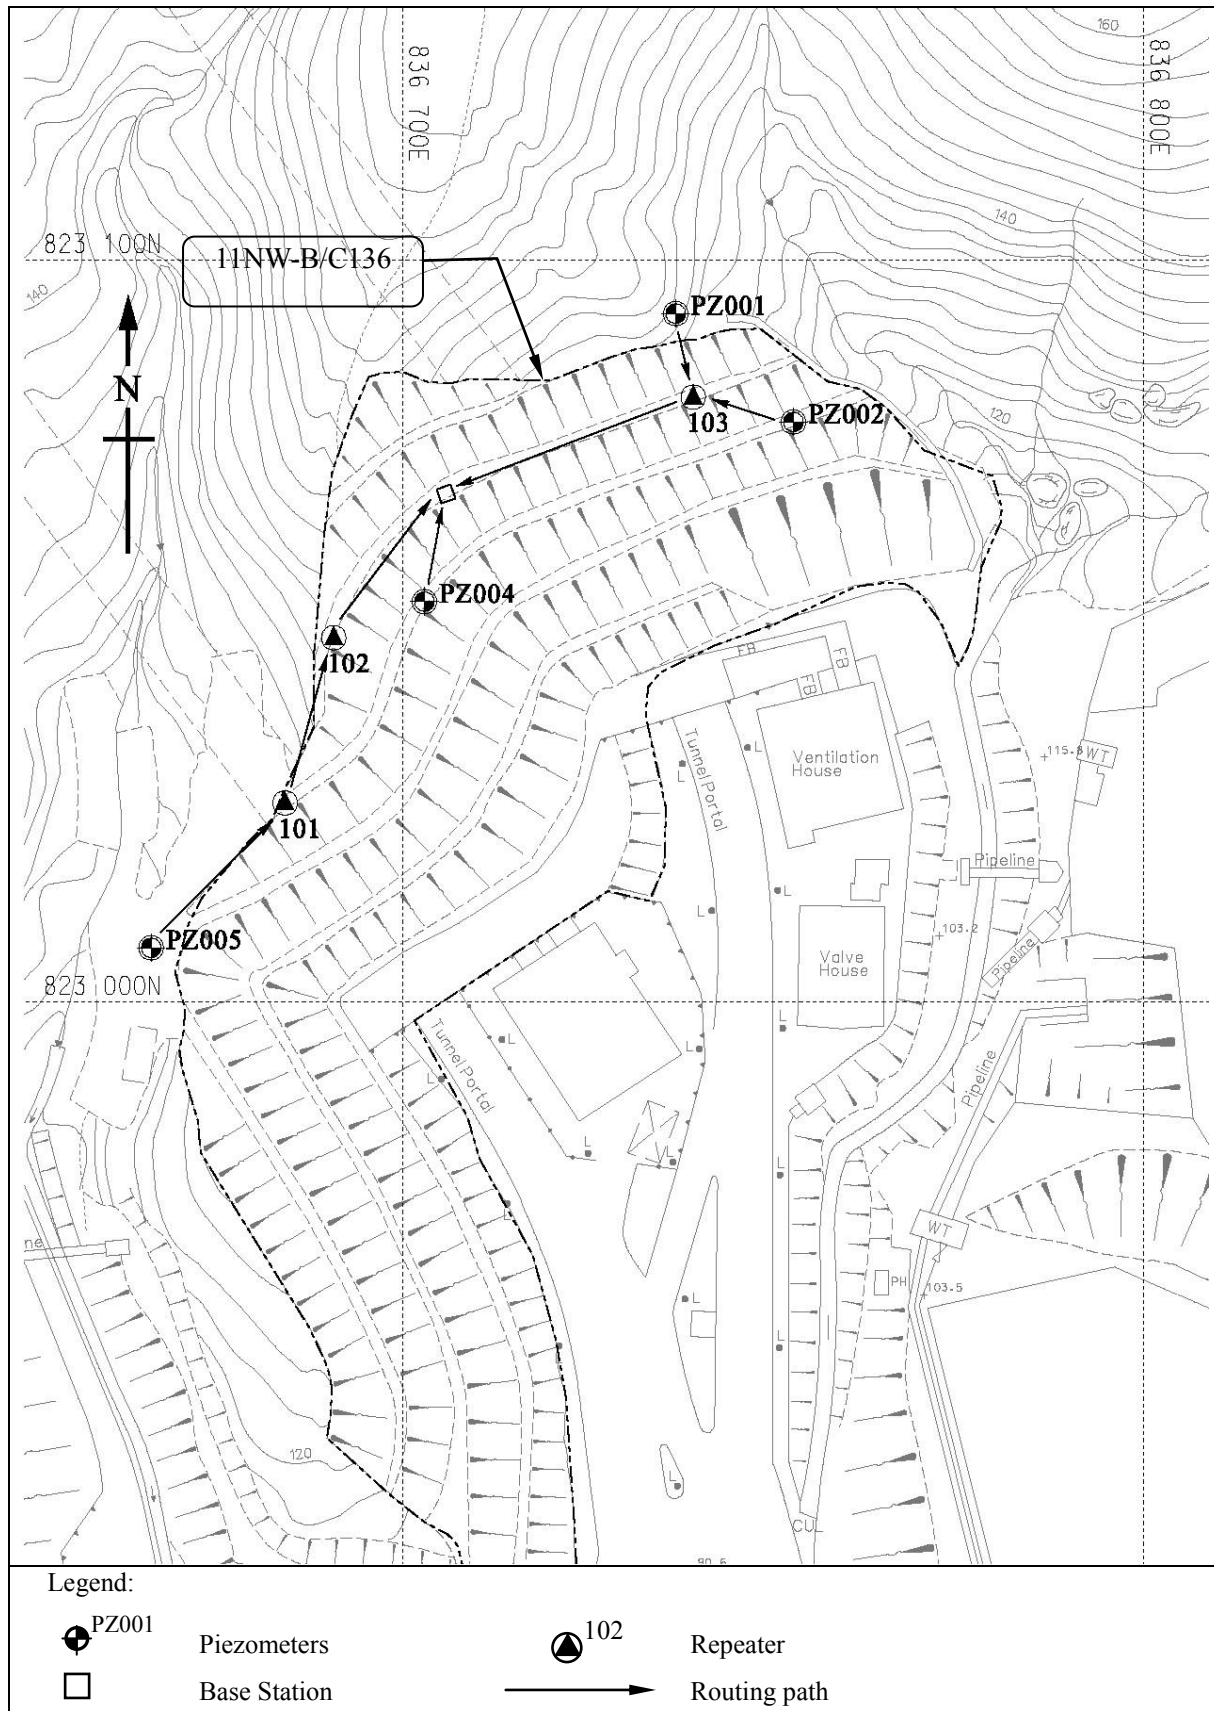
Instrumentation Installed at Slope No. 11NW-B/C136 above Lion Rock Tunnel Road
